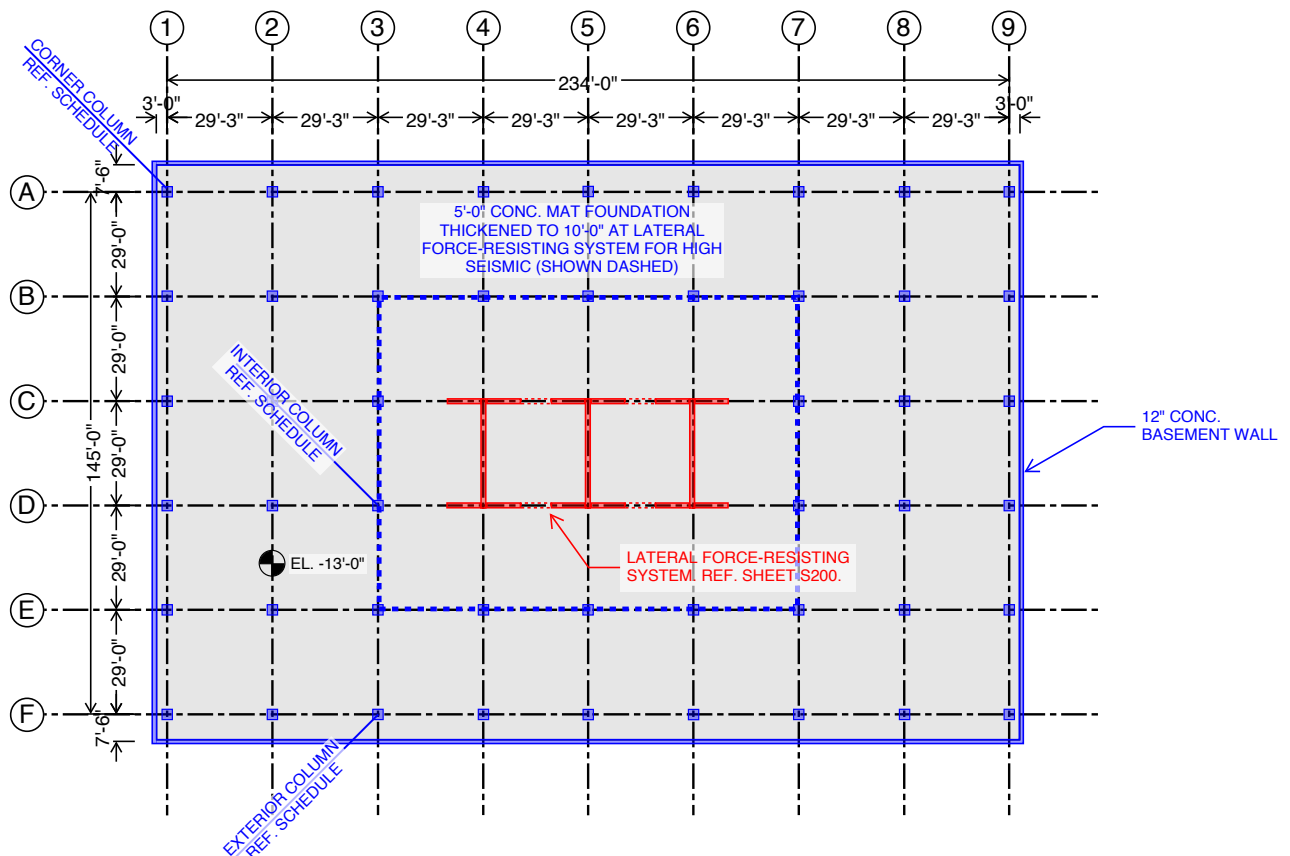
First floor and foundation plan for the large reinforced concrete office building
